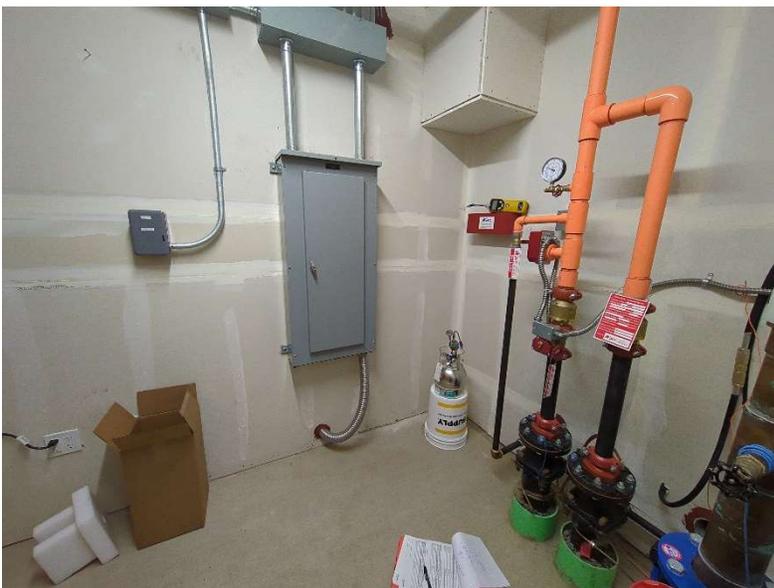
Sample B4-IA1-021924 collection in Building 4 (southeast) electrical riser room (2/19/24).
